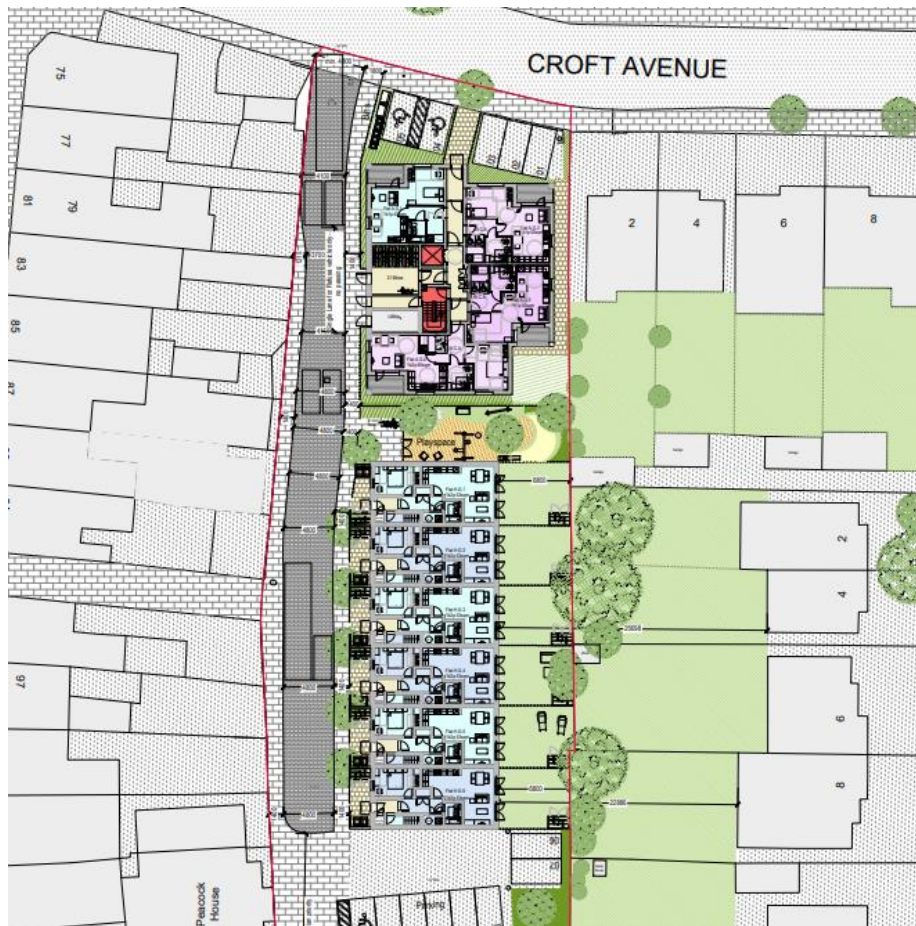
Proposed Housing Ground Floor Plan Site Layout
